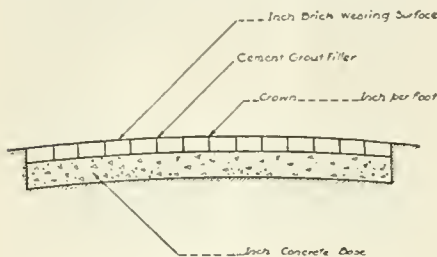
THIS IS A TYPICAL CROSS-SECTION OF THE MONOLITHIC BRICK PAVEMENT FOR COUNTY ROADS. THE BRICK ARE BEDDED IN THE GREEN CONCRETE BASE.
